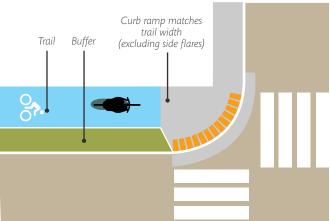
Blended Transition Ramp with Matching Trail and Ramp Width
